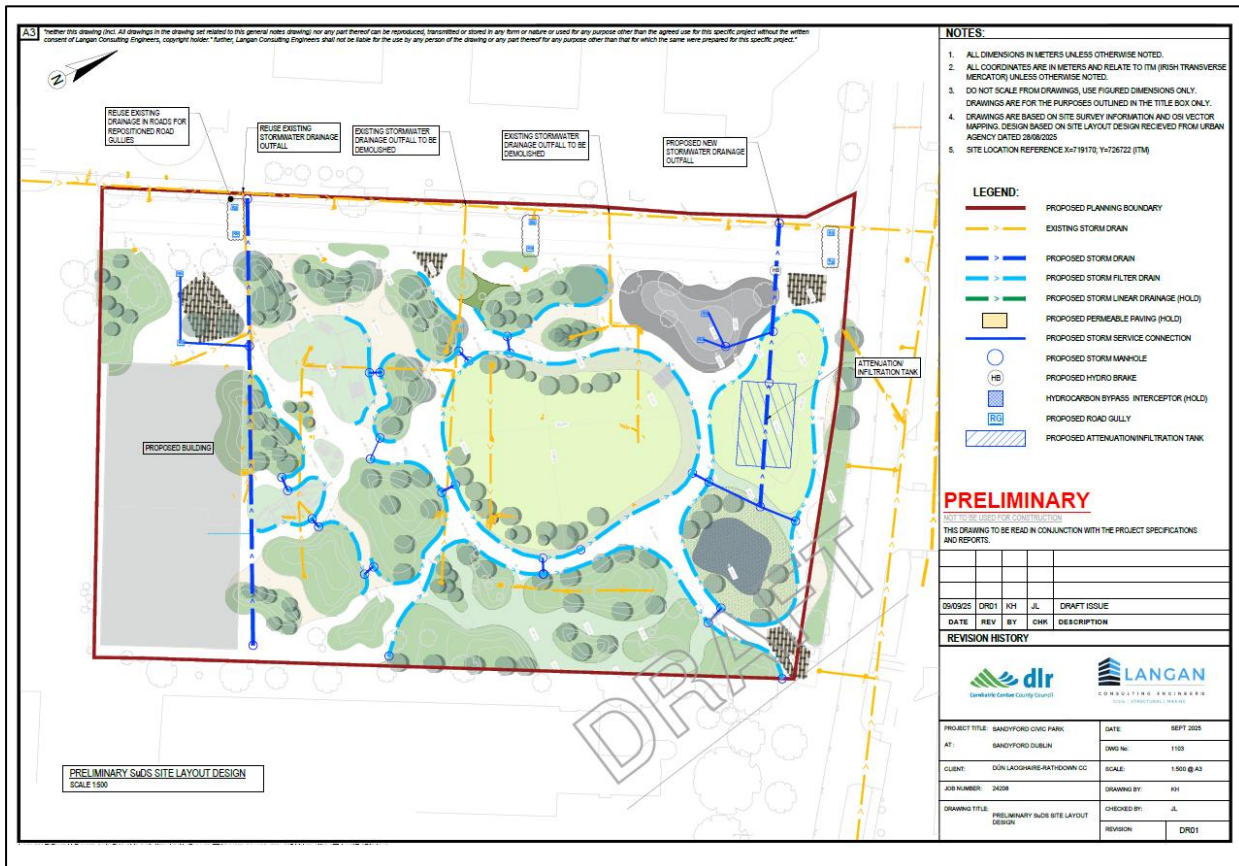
SUDS Layout (source: Langan Consulting Engineers)
